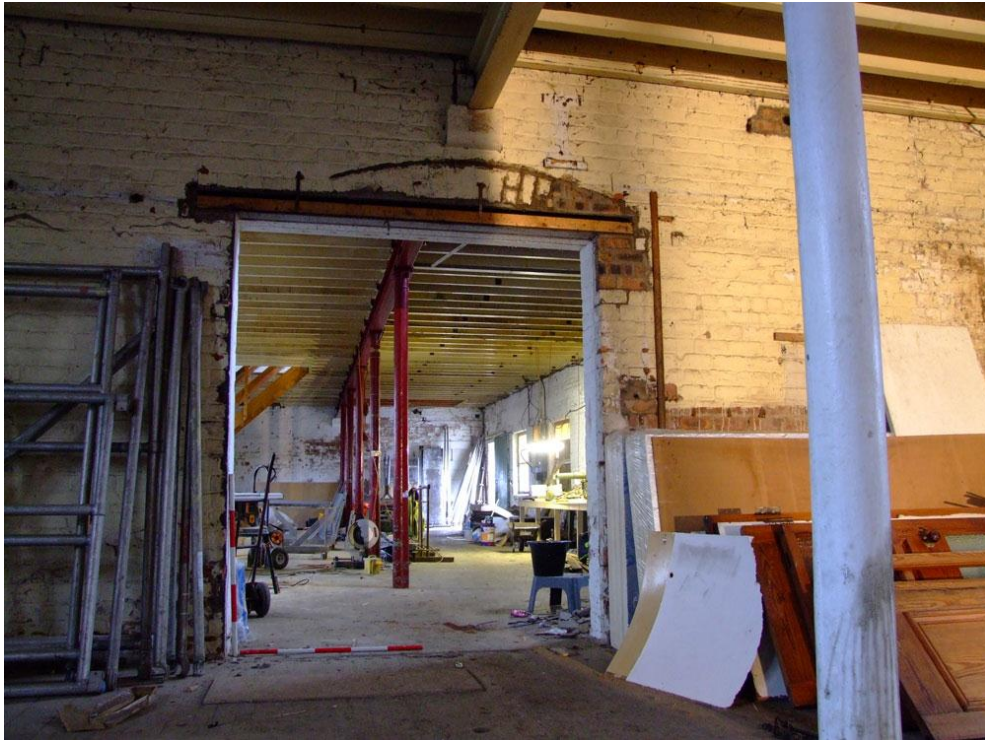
ROOM 3 BEYOND THE CENTRAL DIVIDING WALL - NOTE TRANSITION TO WOODEN FLOOR AND THE ENLARGED OPENING WITH ORIGINAL ARCH VISIBLE ABOVE.
